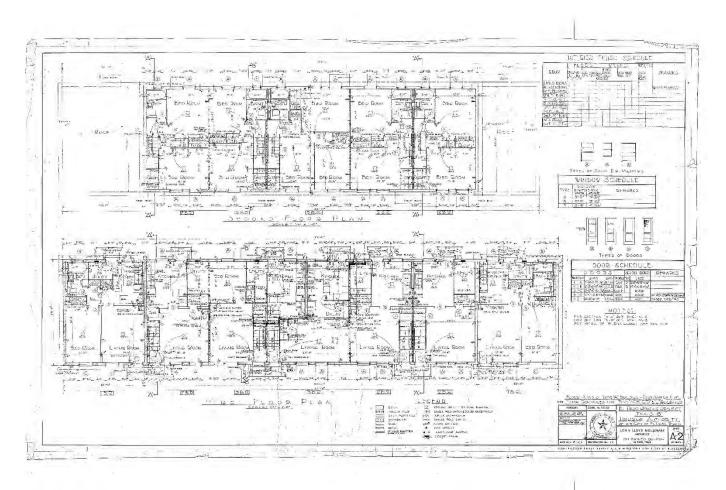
Ray Sherman Place – Original Floor Plan, Section & Details of Type "A" Bldg. by Louis Lloyd Mollinary Architect, dated November 1951.
